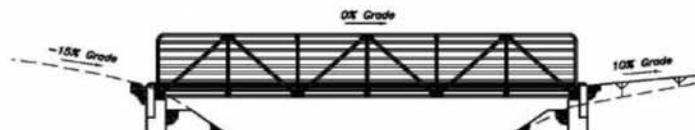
Barrett Lake 4WD Trail Bridge Design
